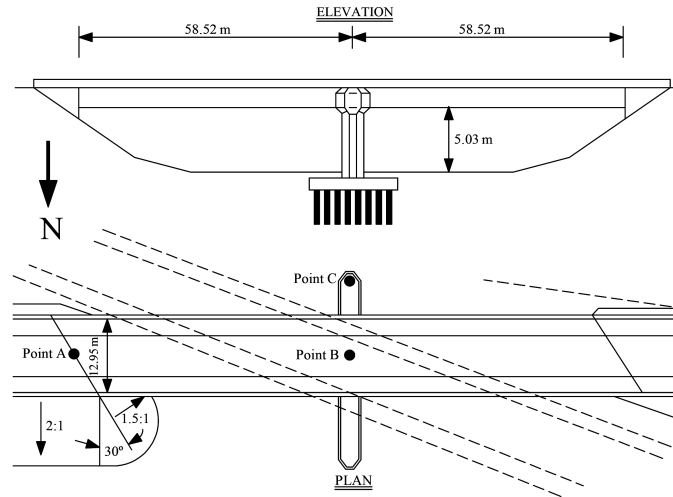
Elevation and plan views of 91/5 over-crossing [1].
